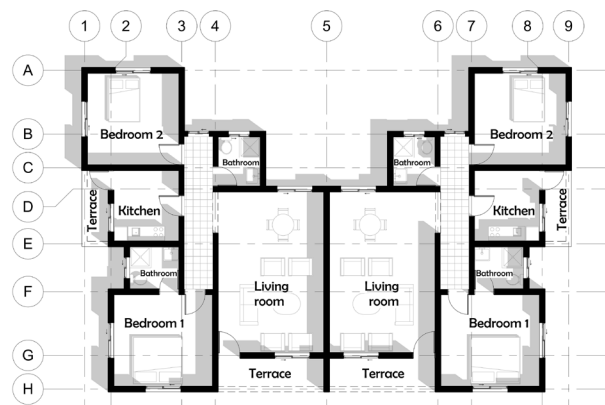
Typical floor plan of the residential typology, adapted from Solid Green Consulting (2017).
